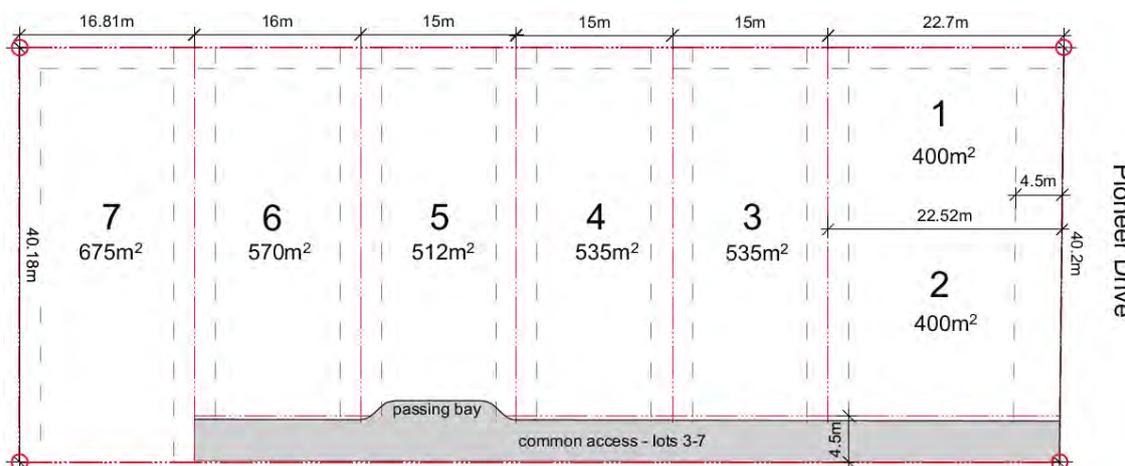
Seven lot subdivision of site (Source: Rough and Milne Landscape Architects Ltd)
